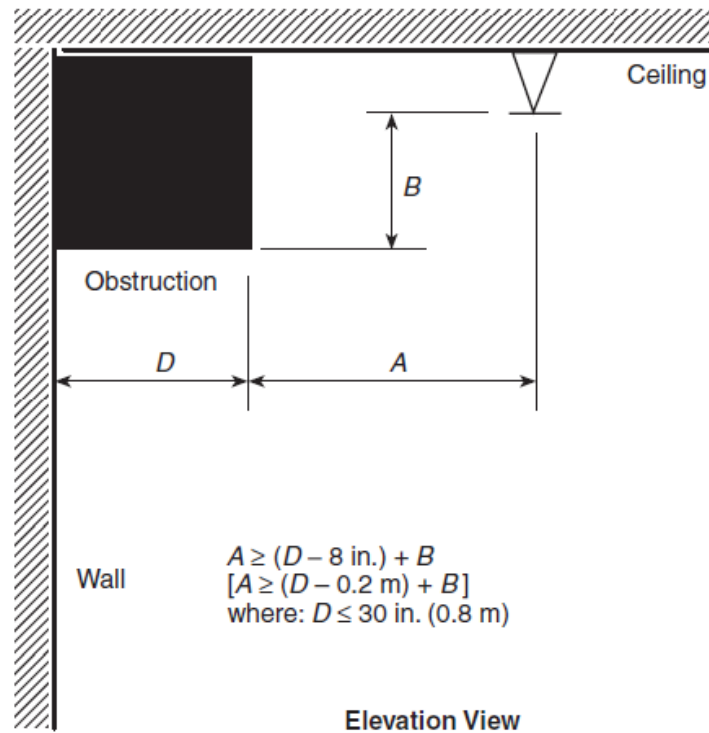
(b) Obstruction Against Wall (SSU/SSP).
